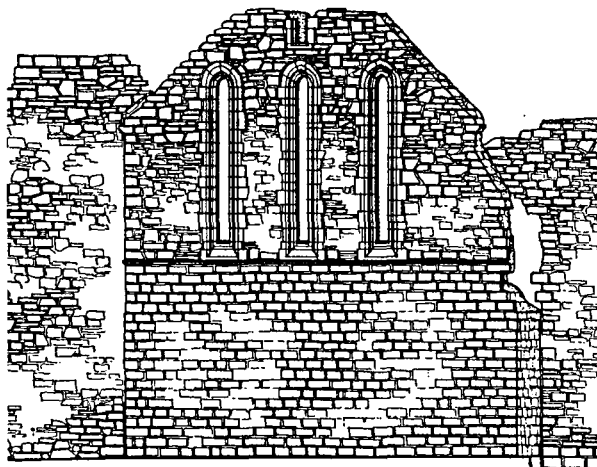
Elevation of chapel gable (north-east wall), Kildrummy Castle
